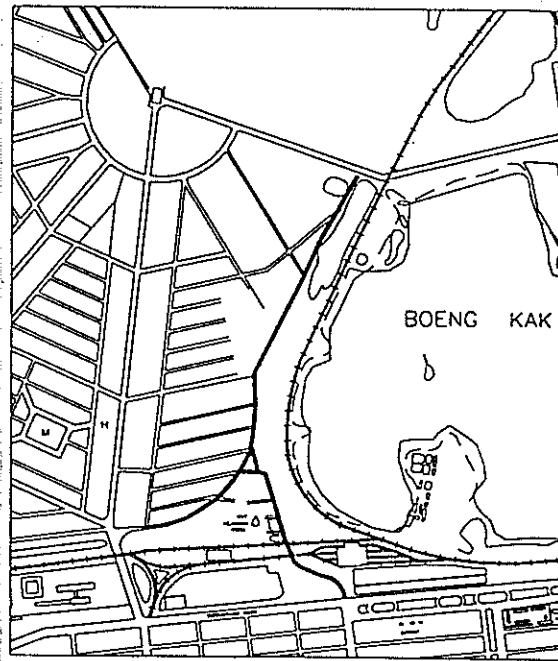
Shortcut between Preah Monivong Blvd and Inner Ring Road
